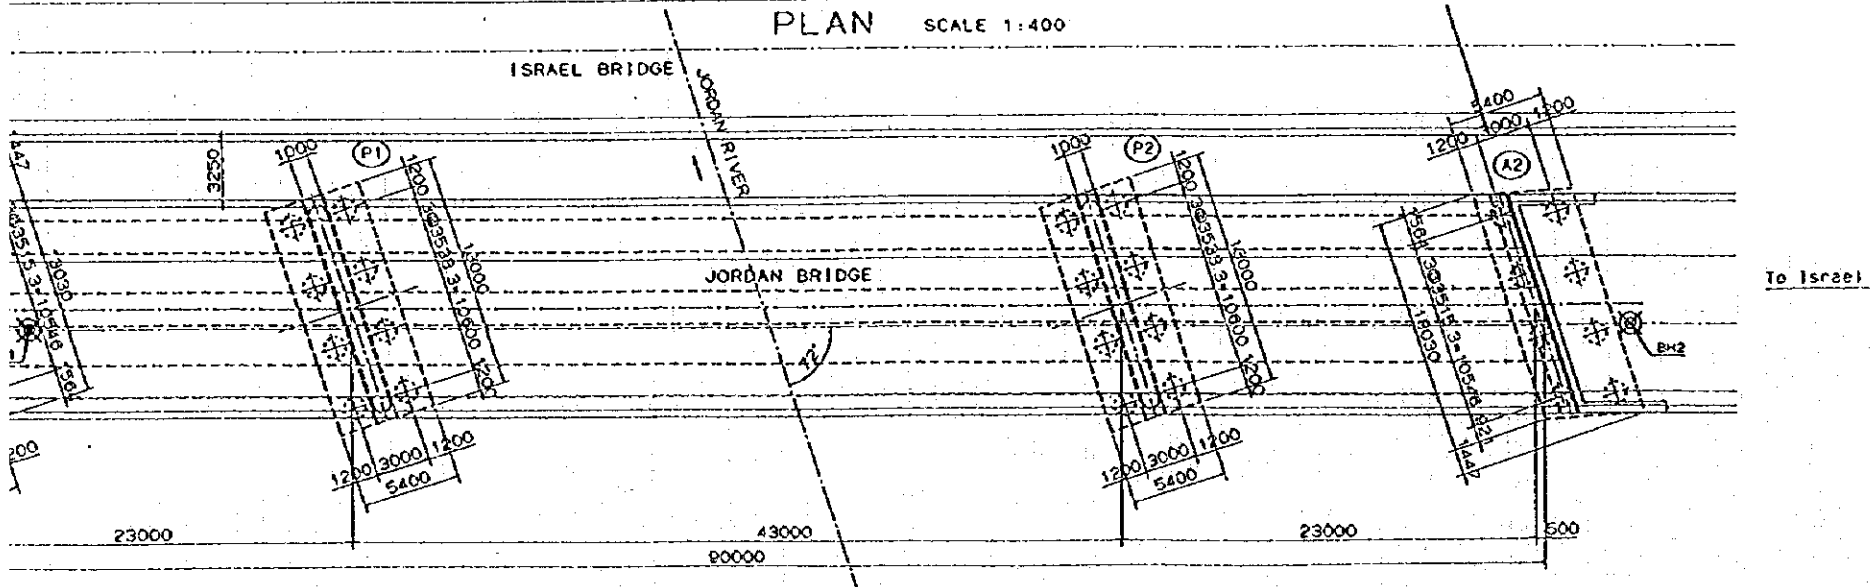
General Layout Plan of Sheikh Hussein Bridge
